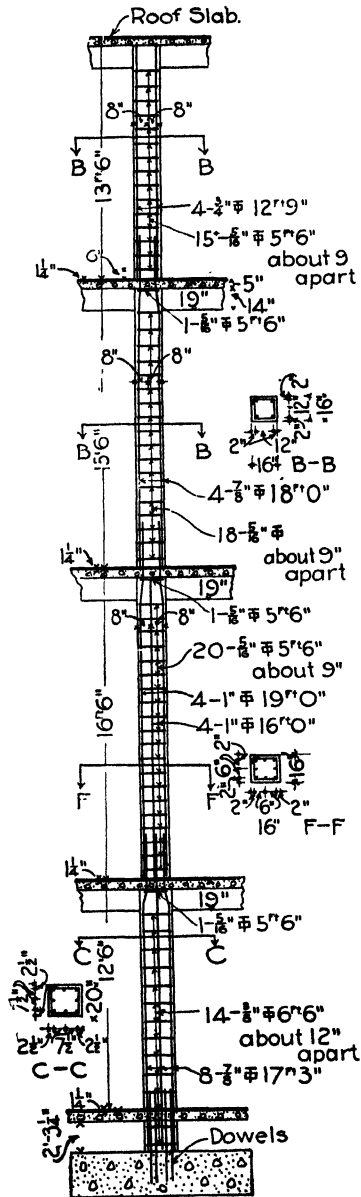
Typical Details of Column Reinforcing. (See p. 634).
